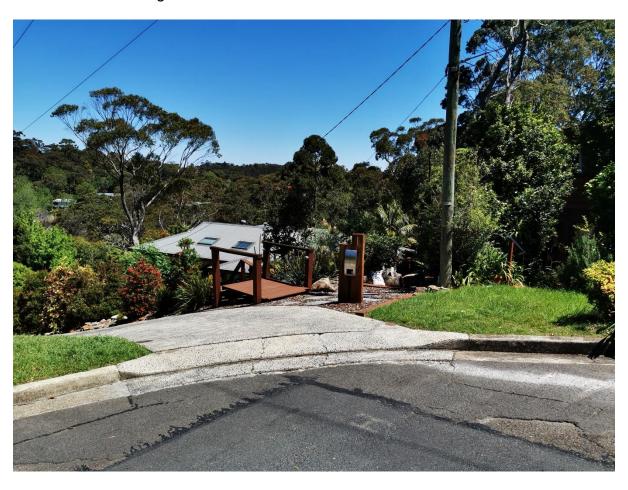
Showing subject dwelling as view from street level. Private concrete access driveway and timber Pedestrian access landing and stairs to the dwelling.
